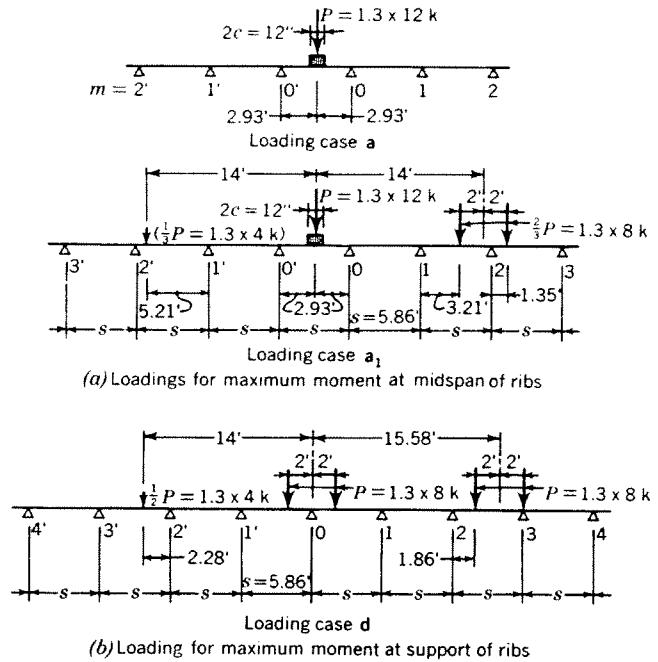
Loadings used in the design of the open ribs in a system with rigid floor beams
